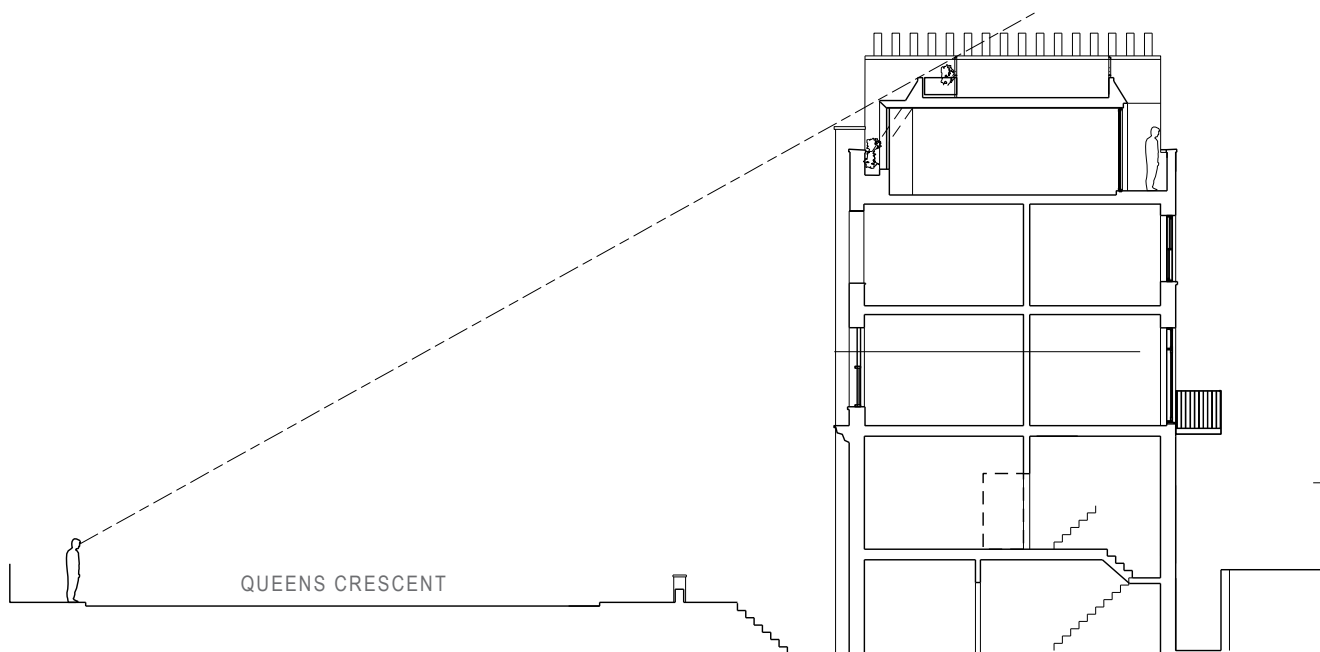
Section showing new balustrade is not visible from Queens Crescent
